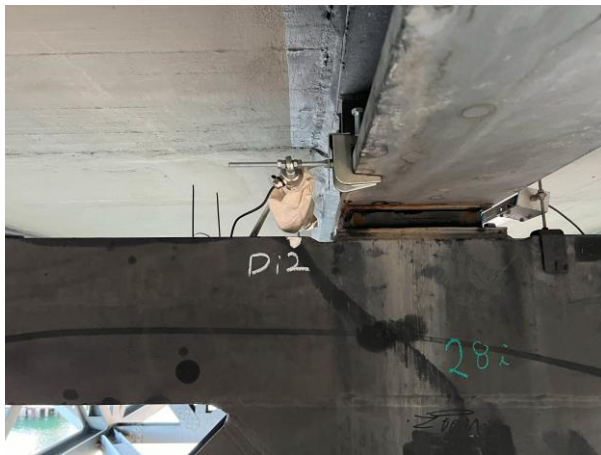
deck structure supported by the steel cross truss by elastomeric bearings.
